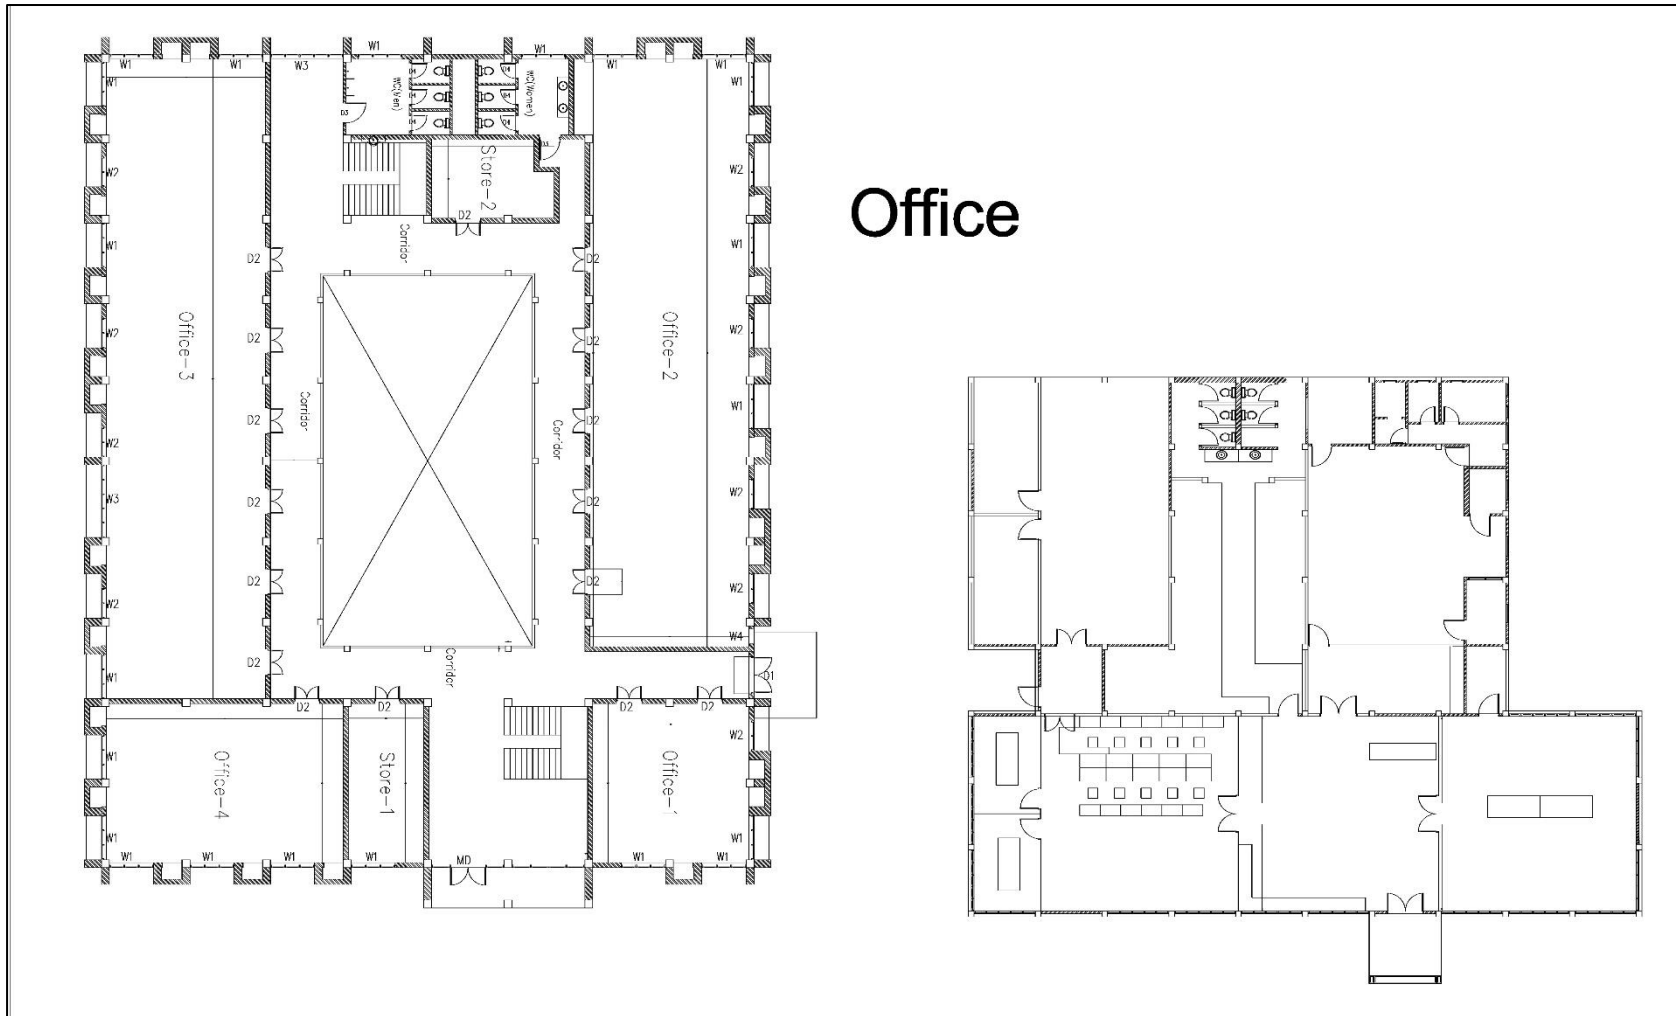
Layout Map of the 2-Story and 1-Story Office Buildings
